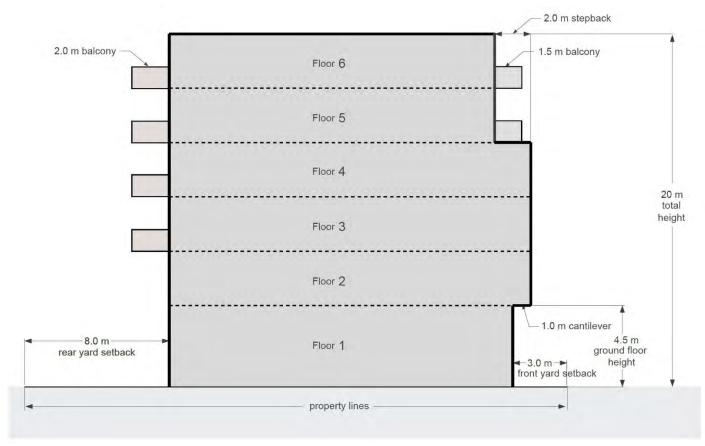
Illustration of Proposed Setbacks and Building Stepbacks
